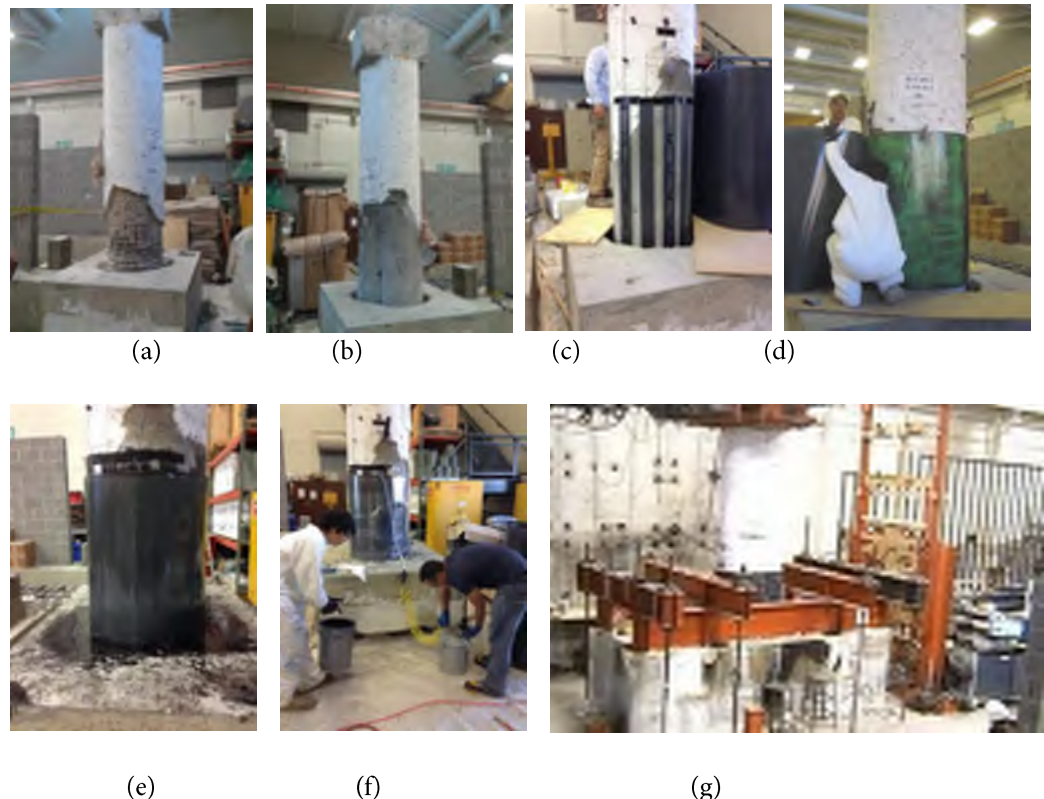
Test of earthquake-damaged bridge pier; a) column with broken steel bars, b) concrete patched, c) carbon strips installed, d) wrapping of PileMedic® carbon laminate, e) filling the base with epoxy, f) injecting epoxy in annular space, and g) re-testing of pier after repair
